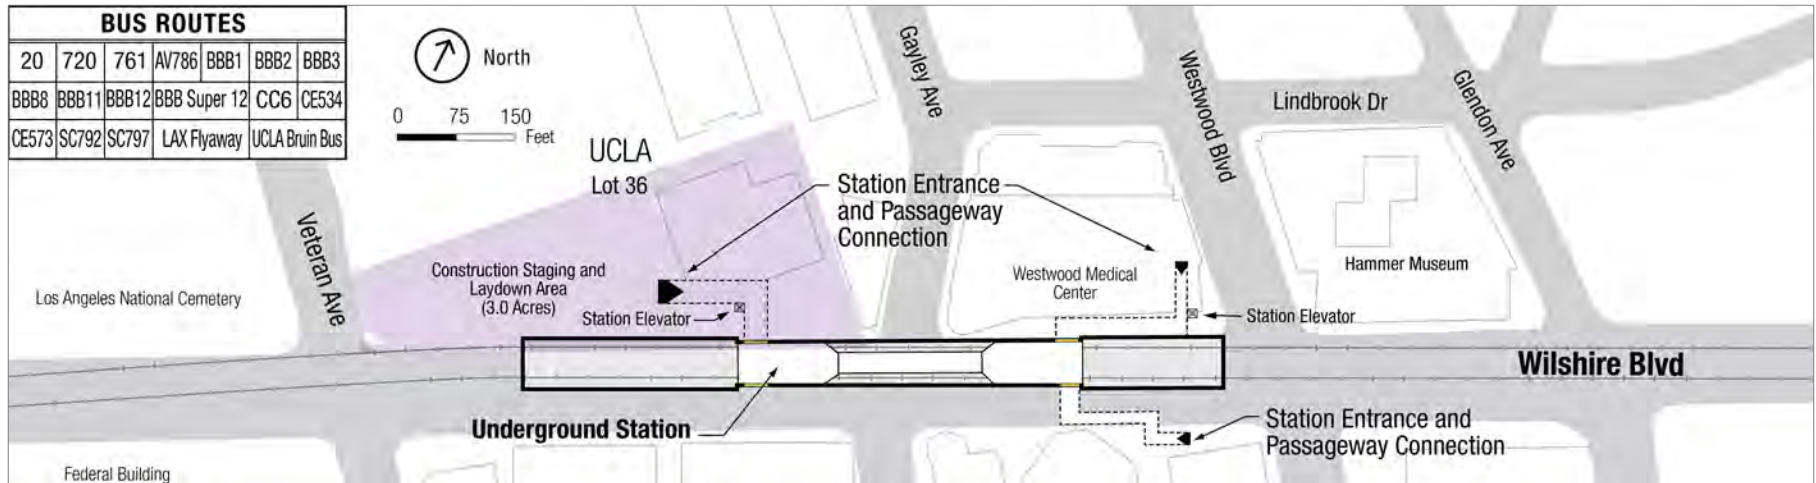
Westwood/UCLA On-Street Station—South of Wilshire
